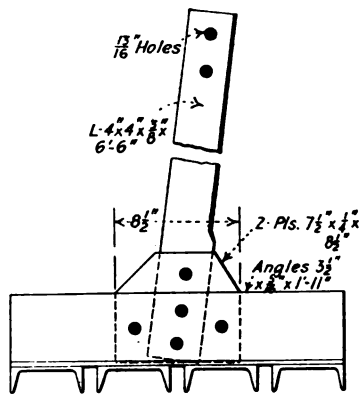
WASHINGTON WATER POWER CO. GRAVEL ANCHOR FOR STEEL TOWERS
